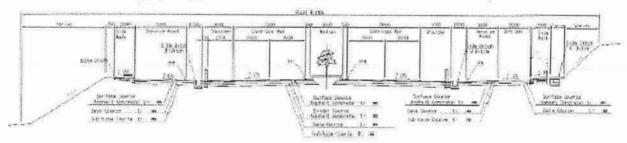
Typical Cross Section (Jagati - Nalinchowk and Sanga - Banepa Section)
